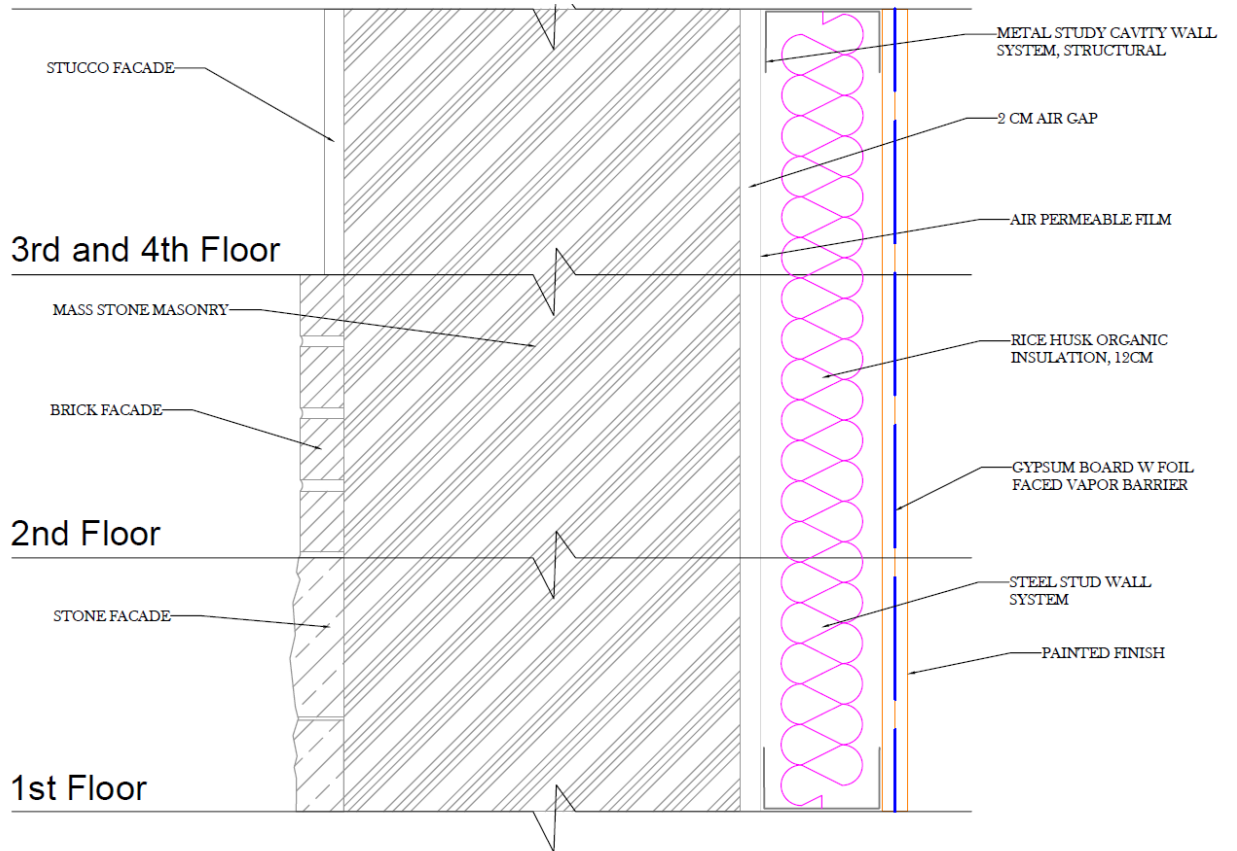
Building 12 Schematic Drawing 1-Wall Section
